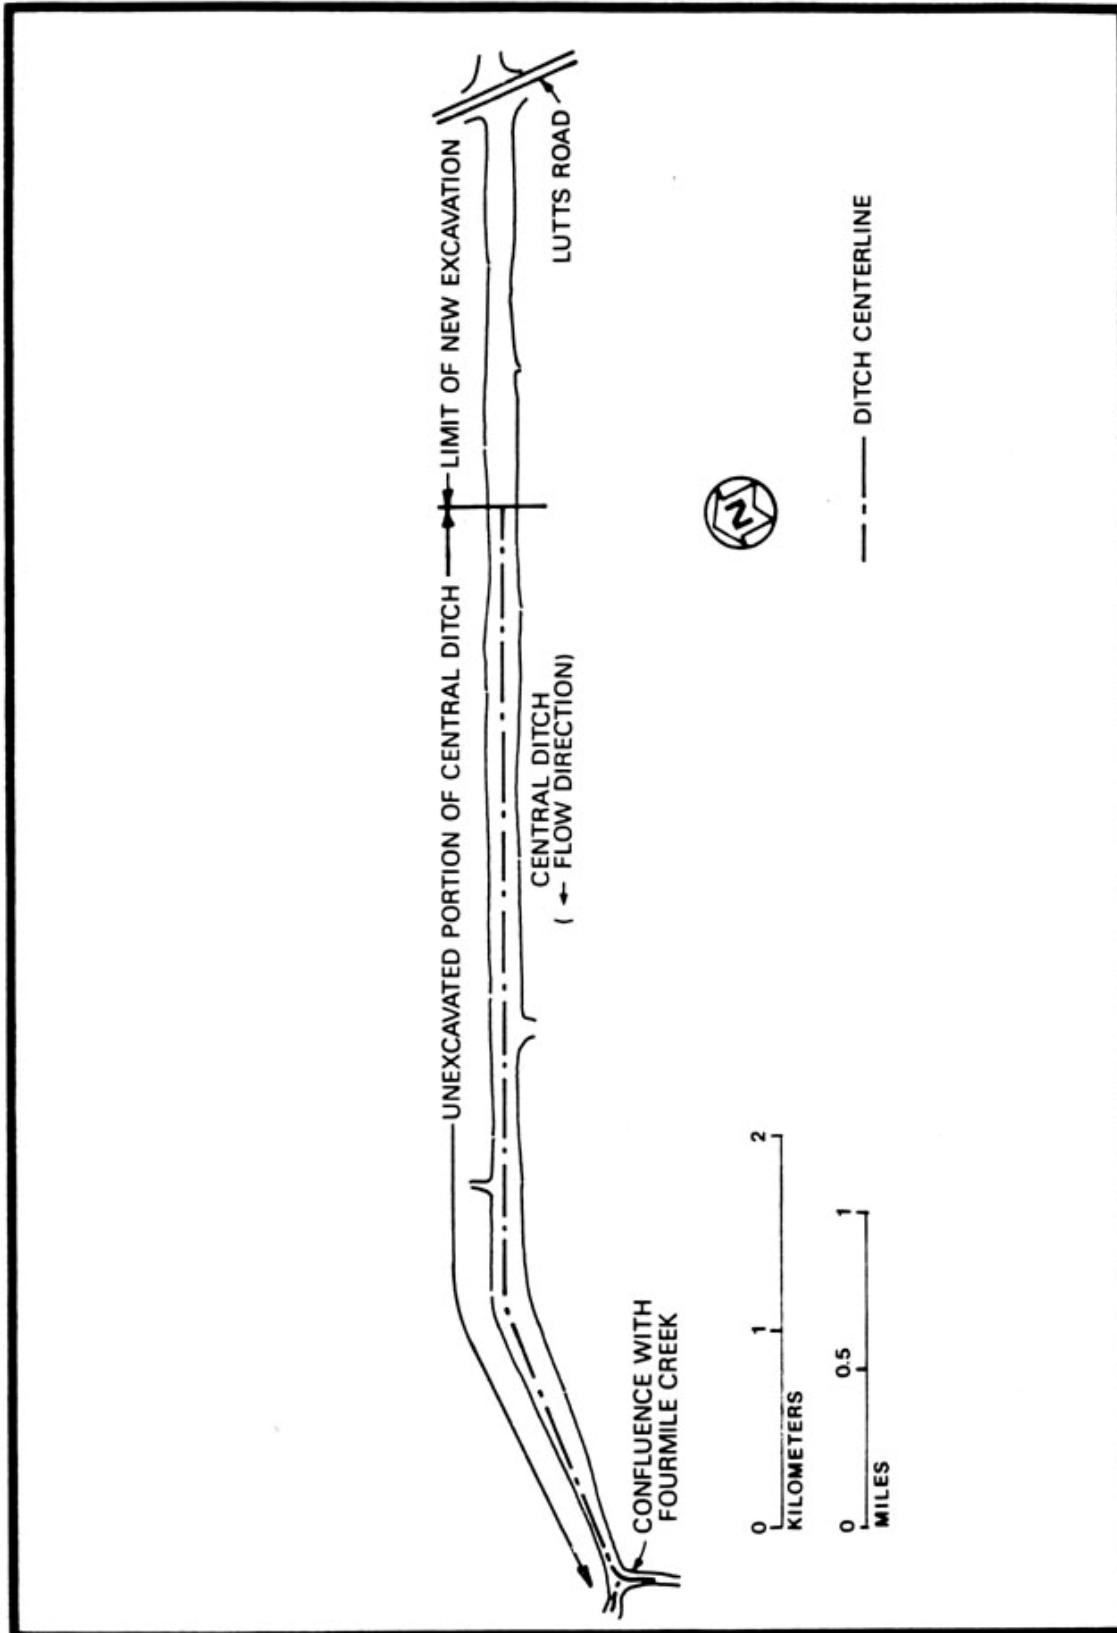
THE CENTRAL DITCH WEST OF LUTTS ROAD
